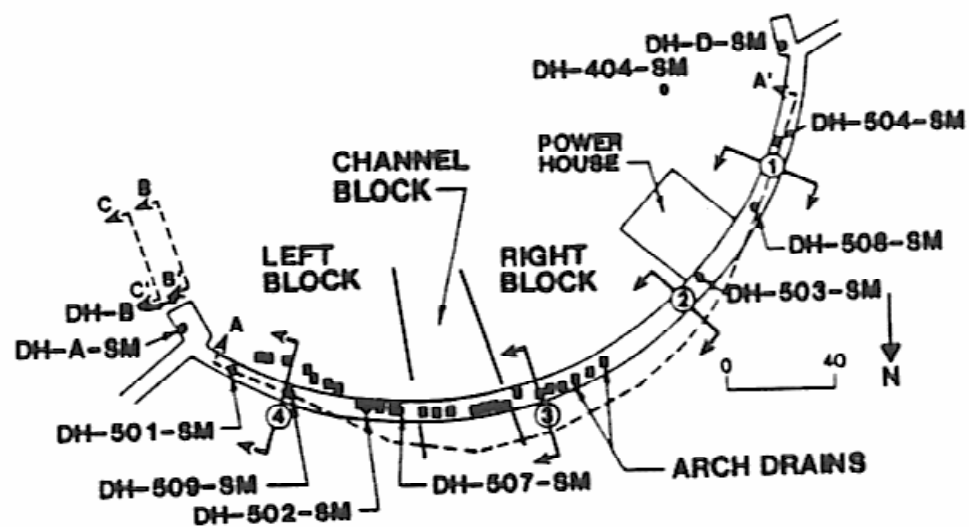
Location of Exploration Holes, Arch Drains, & Typical Sections
